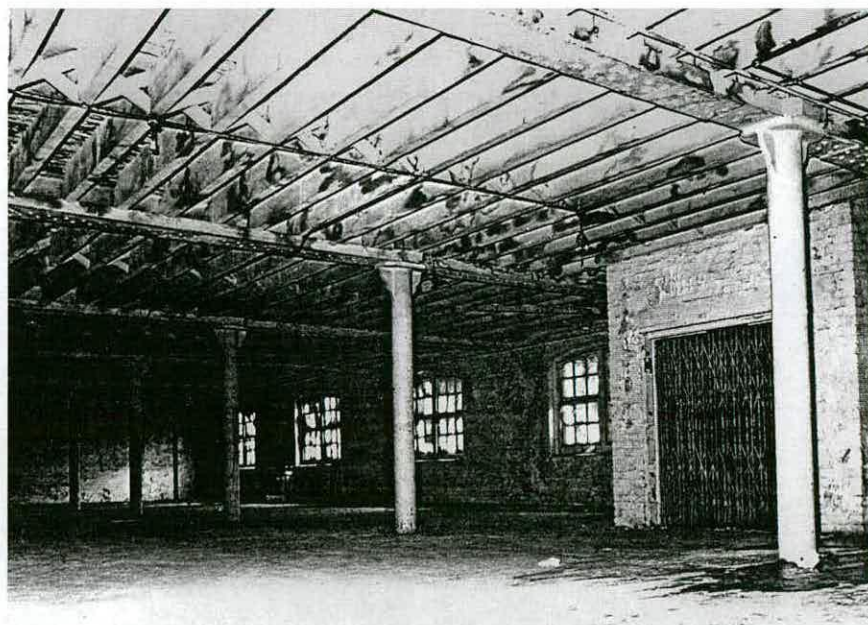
An upper floor of the distillery block (EH 3/87).
